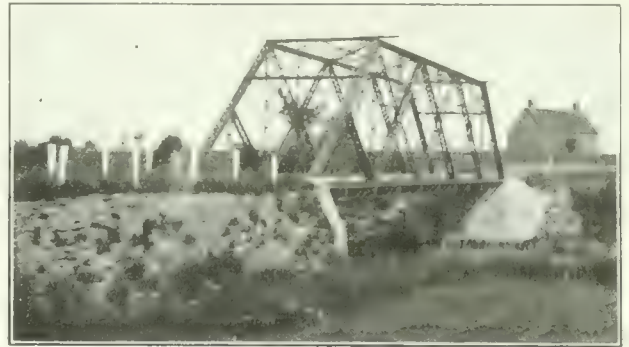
Steel Bridge Over Carter River at Charlebois.
